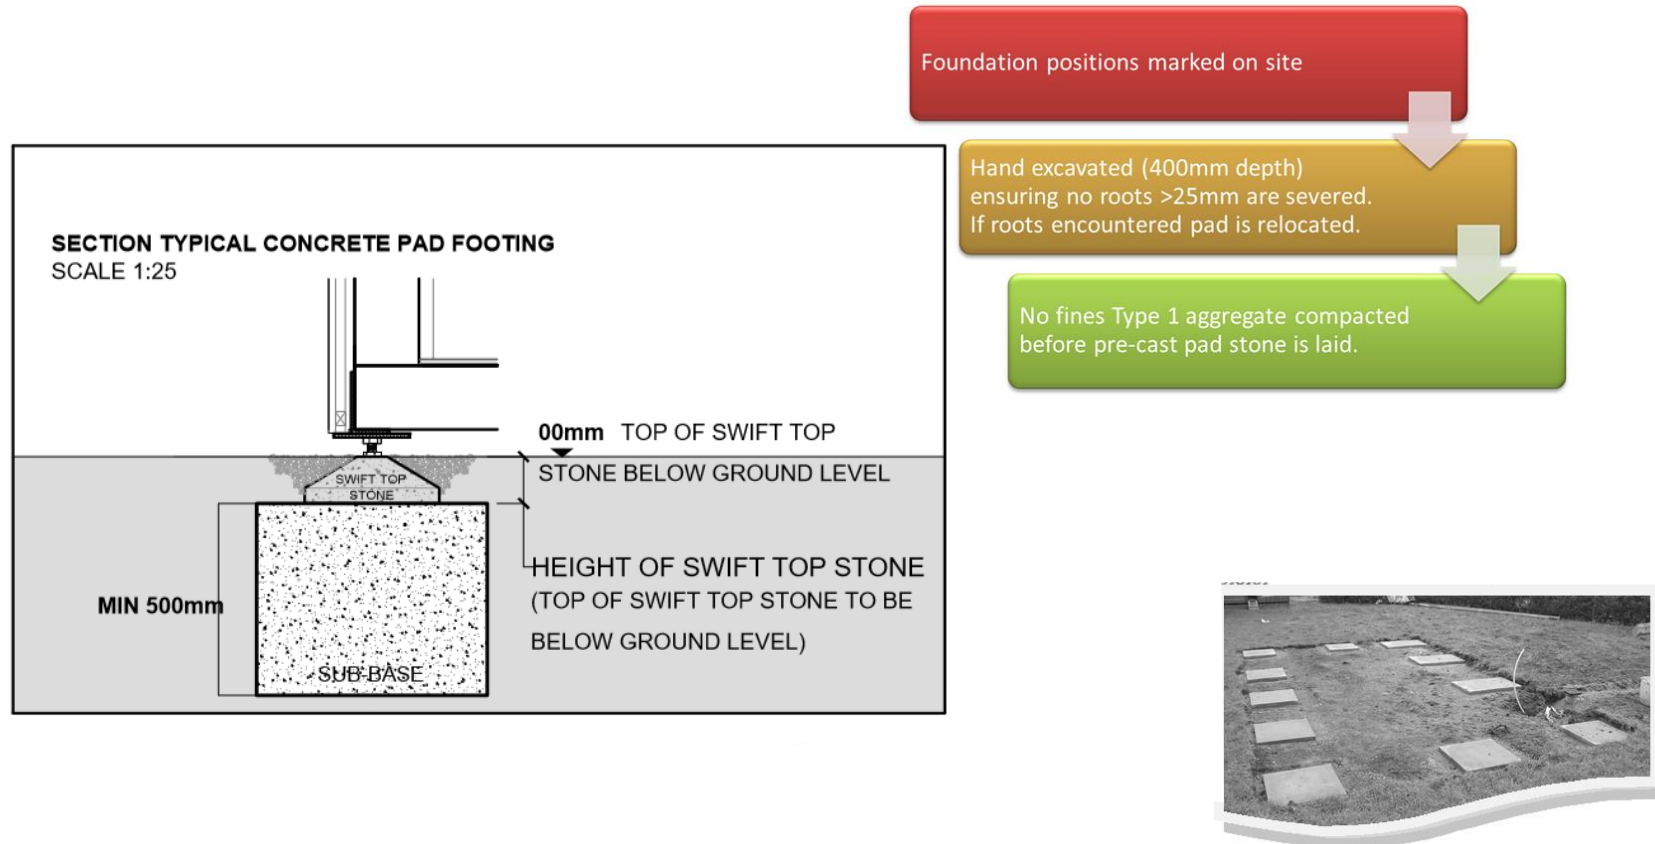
Typical pad detail with installation (inset). This approach removes the need for a ‘strip’ foundation reducing the impact on underlying roots. Pads are hand dug and localised manipulations to retain roots >25mm diameter are possible as a result. (Note: depth as per image not flow)
